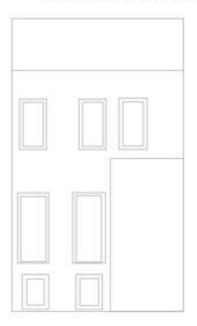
Layout Plan of İzmir Houses Sample with Two Story and Side Hall Plan Type (Source: Boygar.Ö., Restoration Project)
